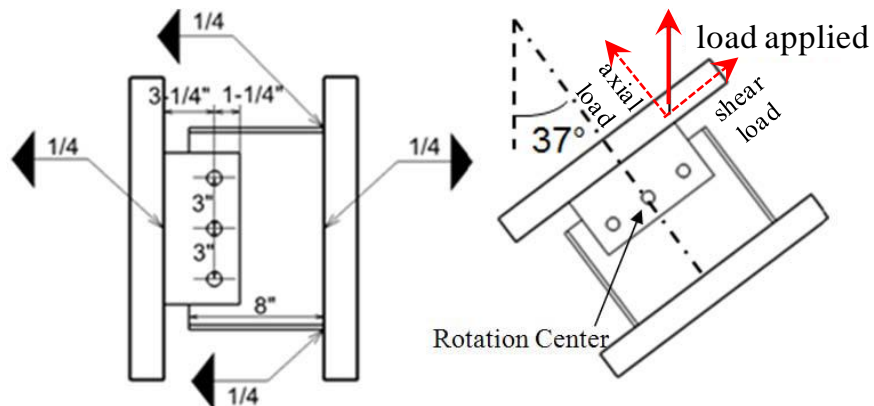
Inclined tension test specimen dimensions, (Guanyu 2011)
